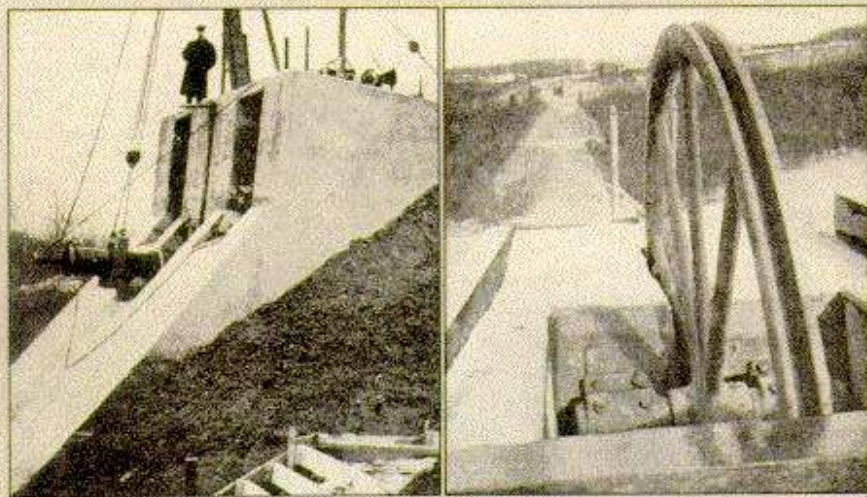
Views of Colt's Point Anchorage. At Left, the Concrete Block Before Erection of Sheave. Automatic Stop Hanging from Block and Tackle. At Right, the Traction Sheave in Place.
